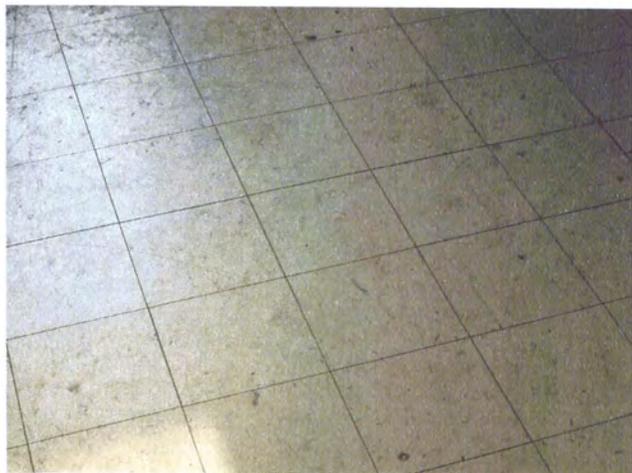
Direction: South. Hangar # 5. Area where floor tile sample 0007 was taken. Sample was from upstairs's office area.
